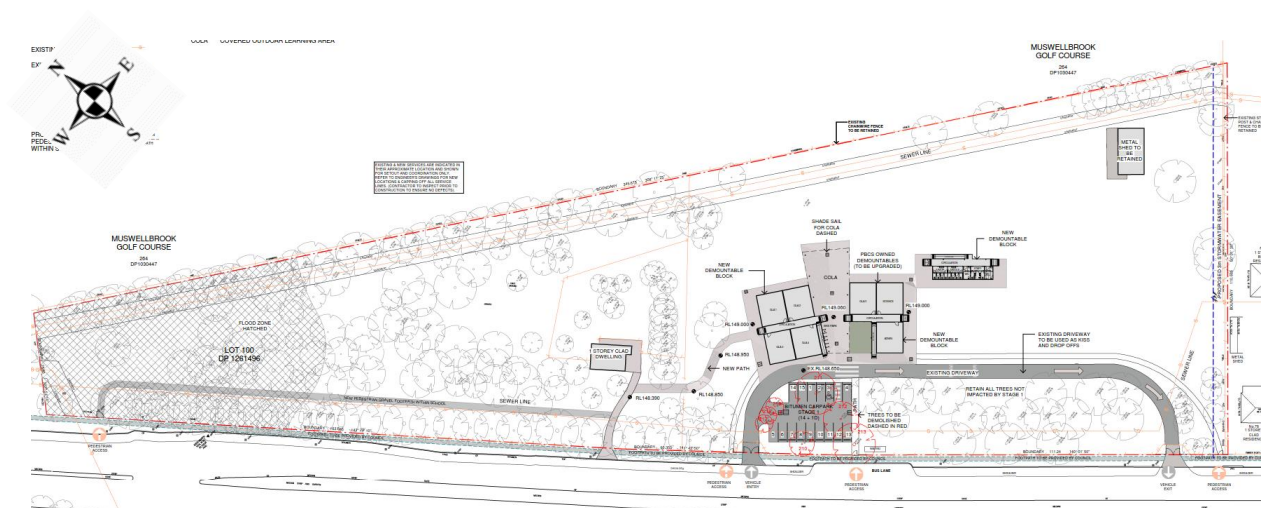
Stage 1 - Site Layout (Source: NBR Architects)
